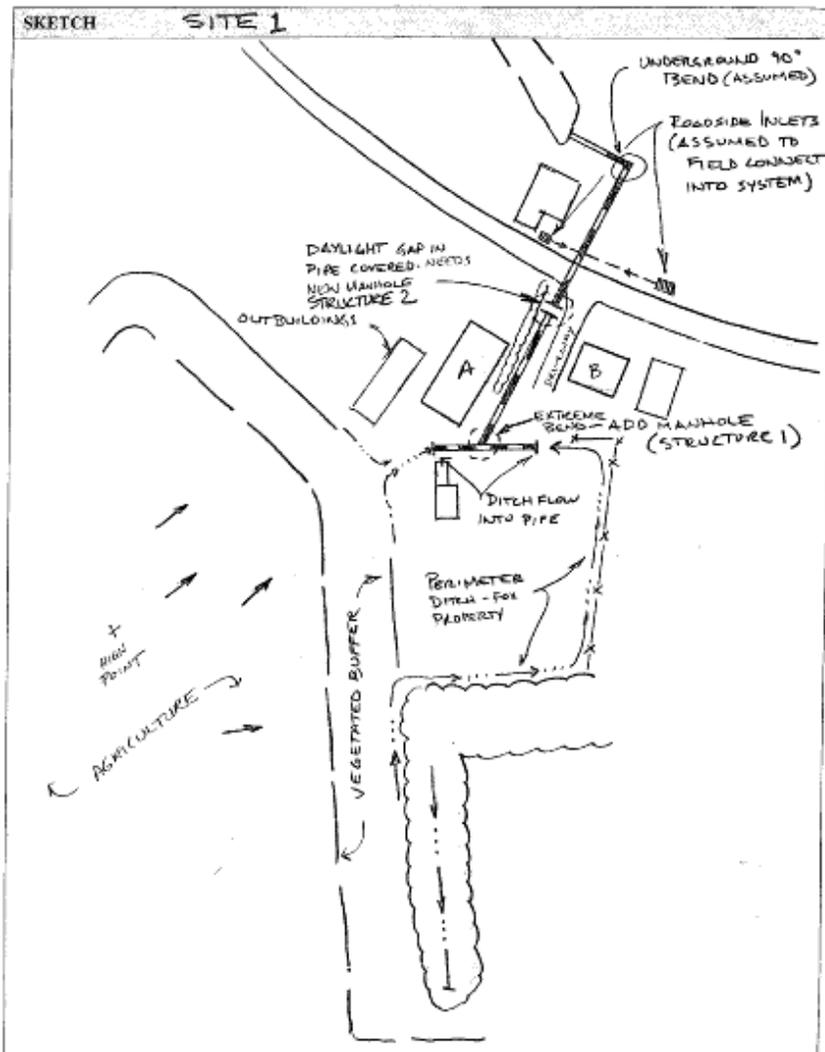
Site 1 system was sketched from field work and includes drainage inlets serving Royal Oak Road.
